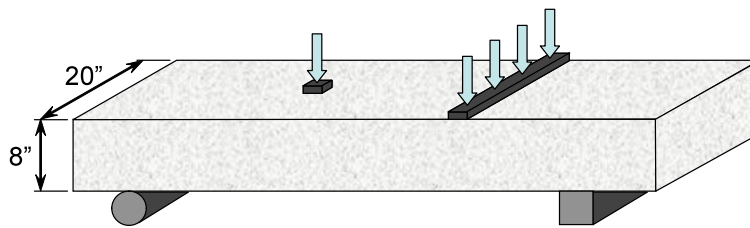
Detail of Leonhardt and Walter (1961) and Furuuchi et al. (1998) test specimens.
